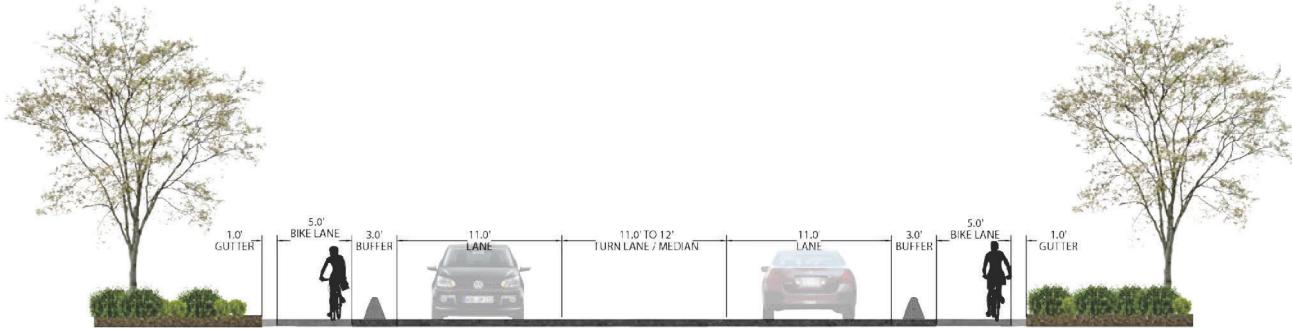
East Jordan Canal Trail typical sections of protected bike lanes on South Union Ave from 1020 E to Union Park Ave.
